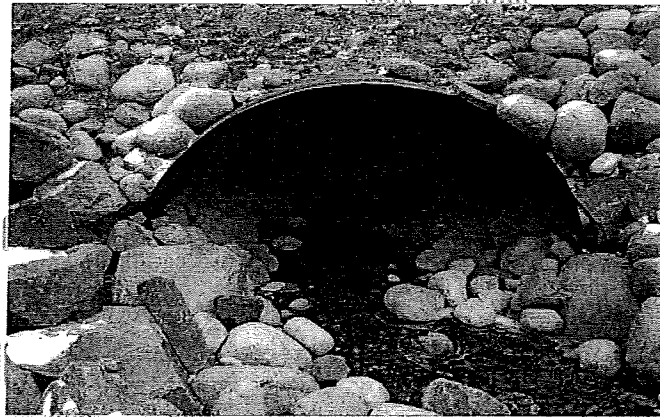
Typical Bottomless Culvert (WSDOT 2010)
